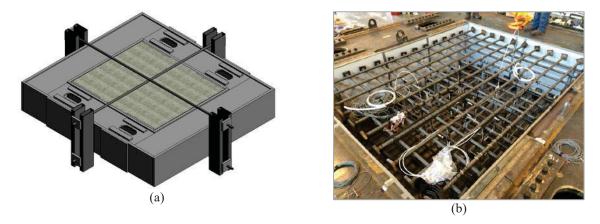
(a) Confined thick concrete specimen design. (b) Picture of rebar frame and steel frame for confined concrete specimen.
